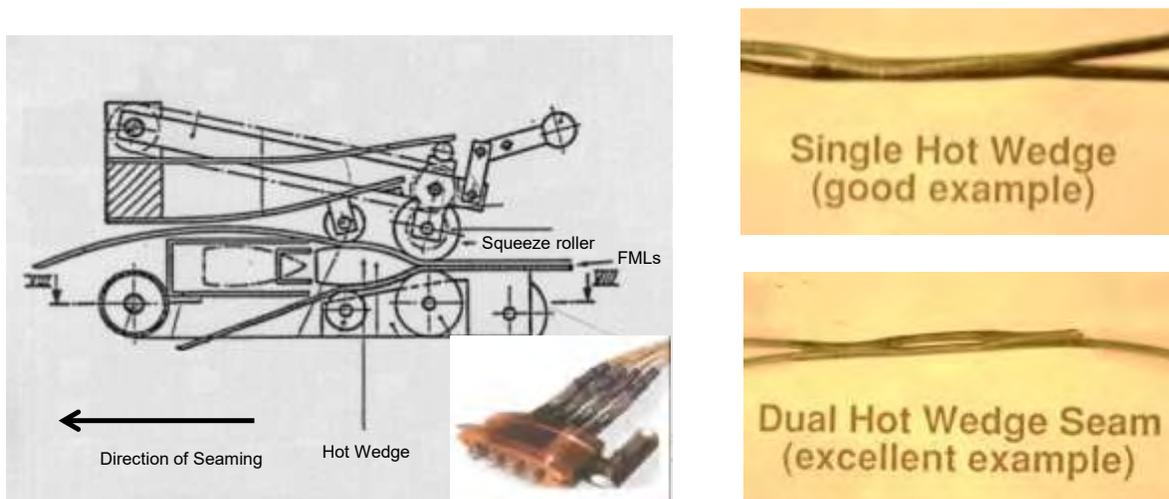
Hot wedge welding device, the wedge itself and resulting single and dual track geomembrane seams, the latter with an open air channel for pressure testing.
